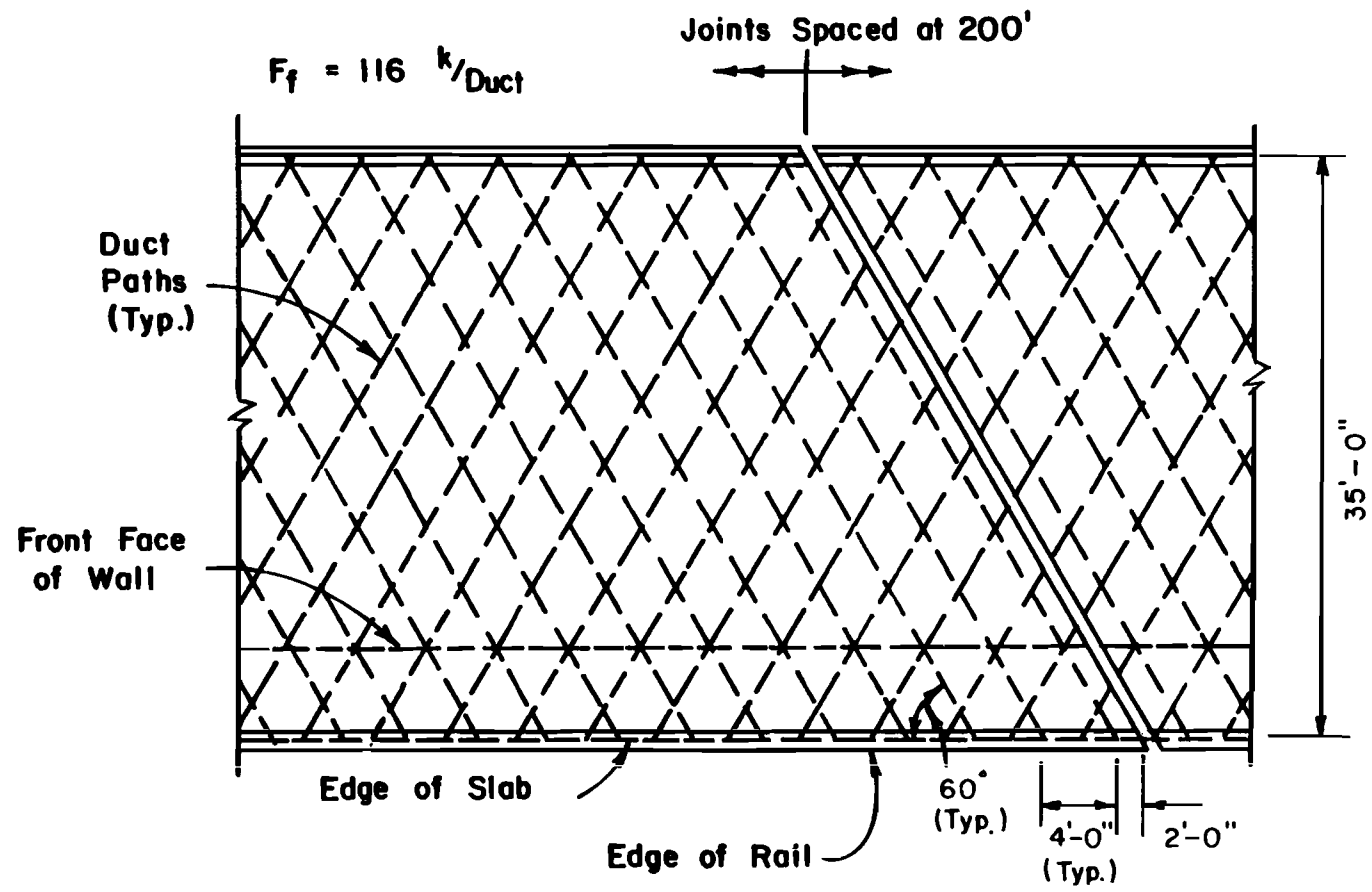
Partial plan of prestressed roadway slab for I-70 through Glenwood Canyon, Colorado [40]
